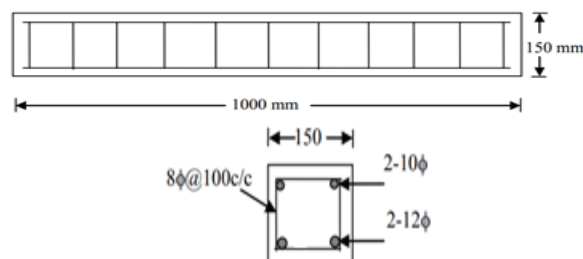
REINFORCEMENT DETAILING OF RCC BEAM
